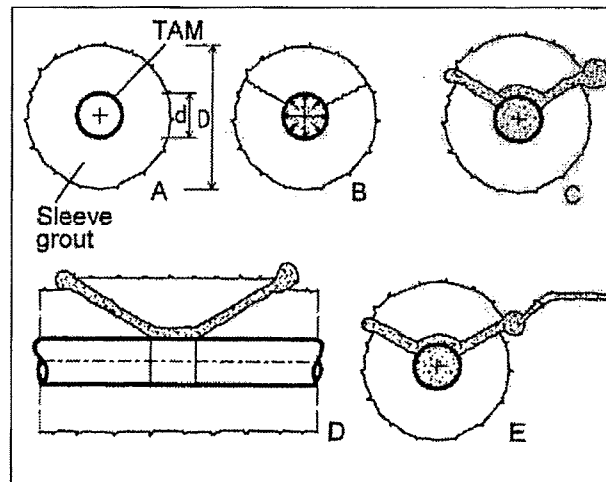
Application of soil fracture grouting using TAMs (Chambosse & Otterbein, 2001)
